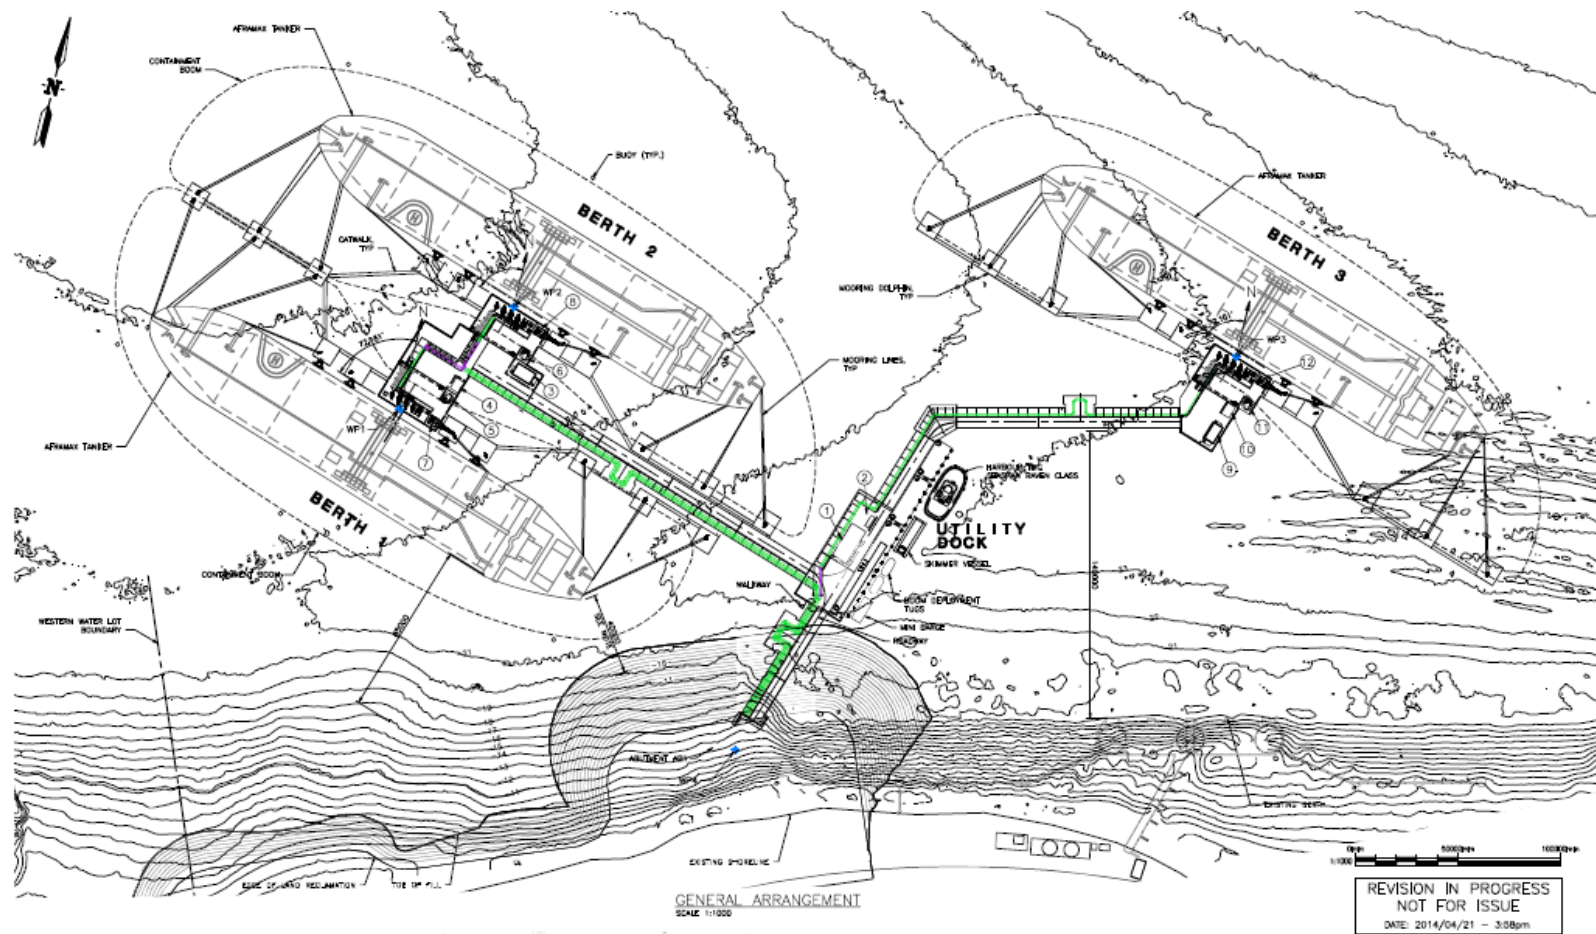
General Arrangement Plan for the Proposed Westridge Facilities
